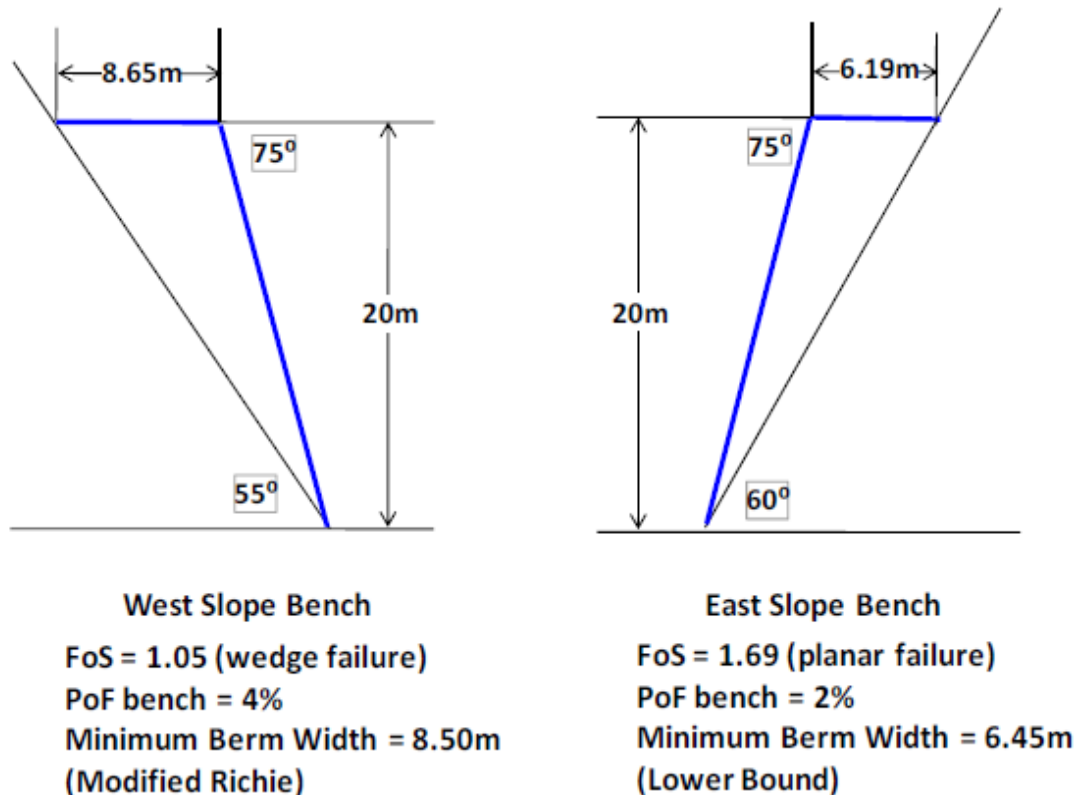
Recommended bench configurations and their stability controls (SRK, 2009)
